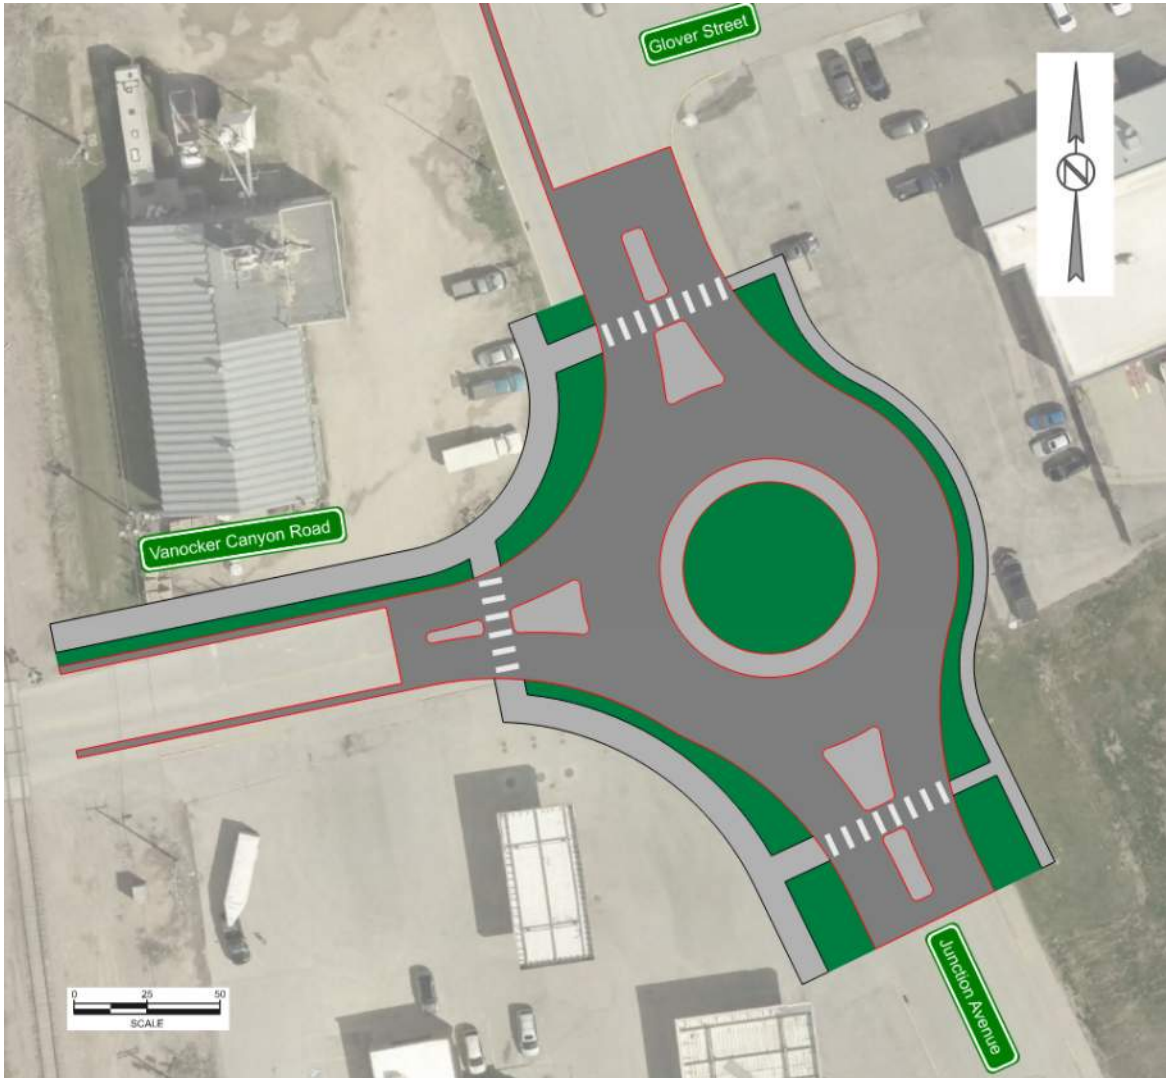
Vanocker Canyon Road & Junction Avenue (roundabout)
